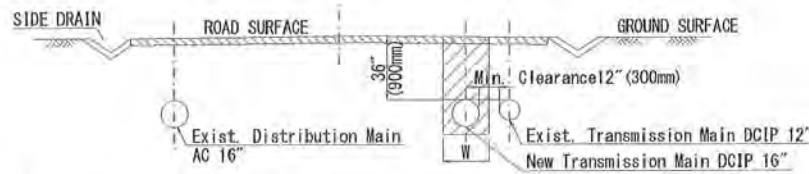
Typical Section of Additional Water Transmission Main-2 (KB Bridge - Ngerkeswaol)
